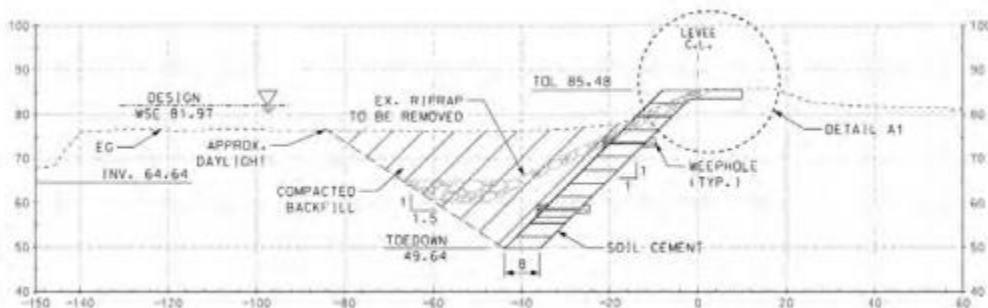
Typical Cross Section of Alternative 1, Soil Cement for Design Flow (Sta. 270+00)
